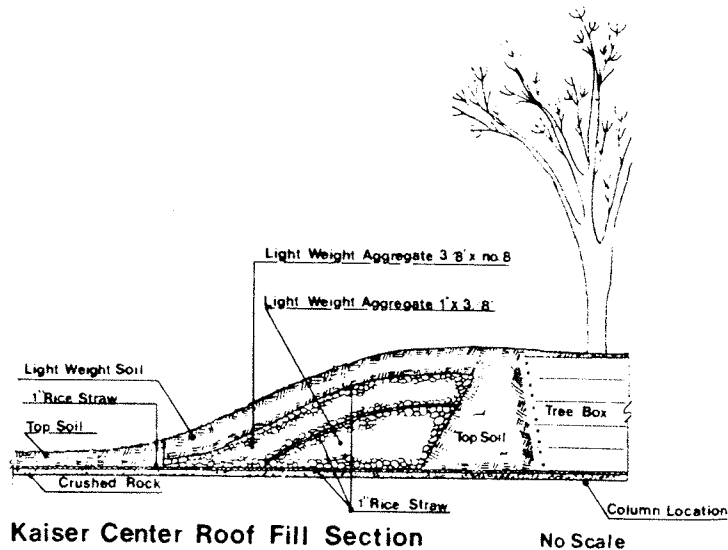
Kaiser Center Roof Fill Section (From Osmundson, 1979.)
